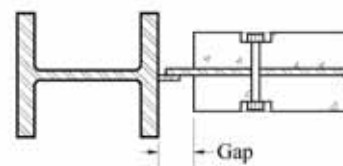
Detail of a C-SPW with a gap between the concrete elements and the boundary elements.
